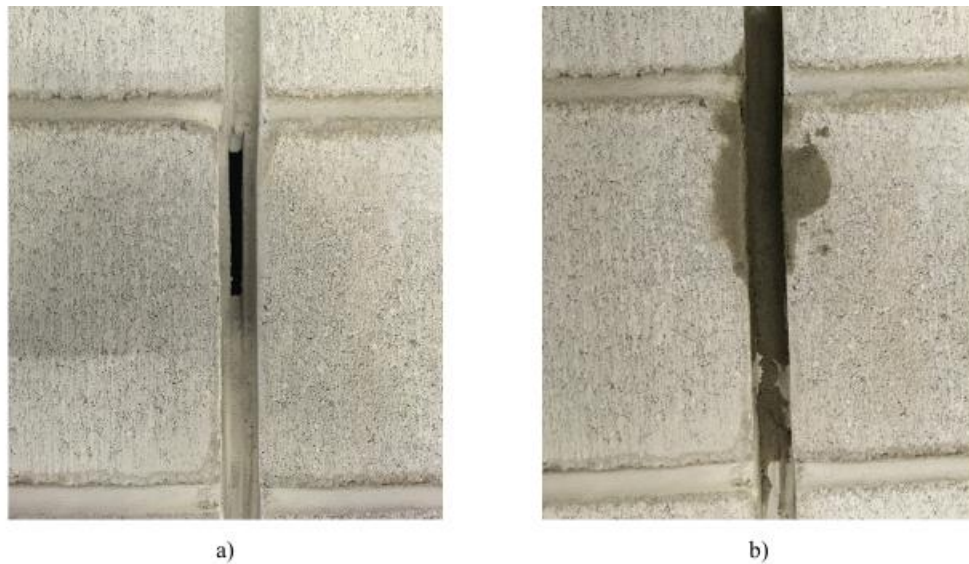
Mortar head joint of SRCMU wall: a) partially open head joint; and b) re-pointed head joint
